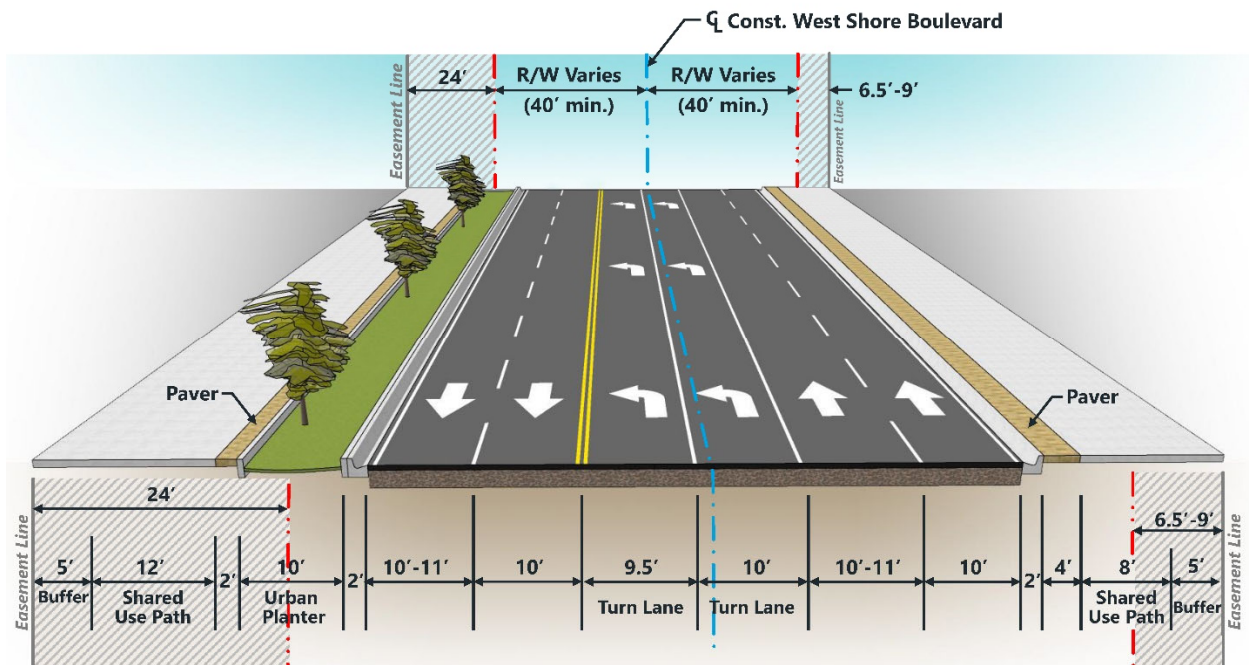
Proposed Typical Section Looking North beneath I-275 (SR 93)
